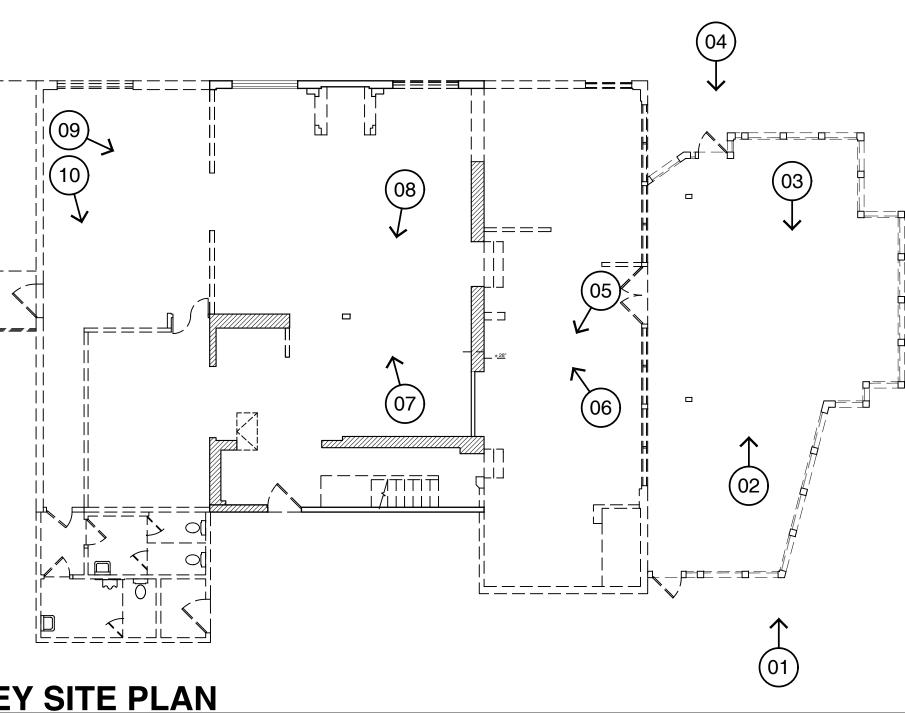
PHOTO KEY SITE PLAN SCALE: 1/32" = 1'-0"
